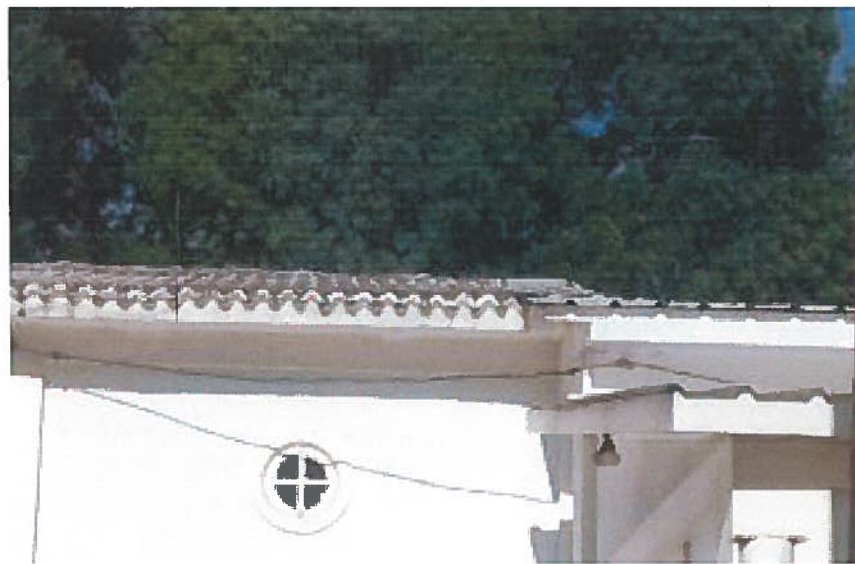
Side view of Church. Left side the old roof corrugated presumed asbestos containing transite panels are noted. Right side, new metal panels covering the back part of the structure.
